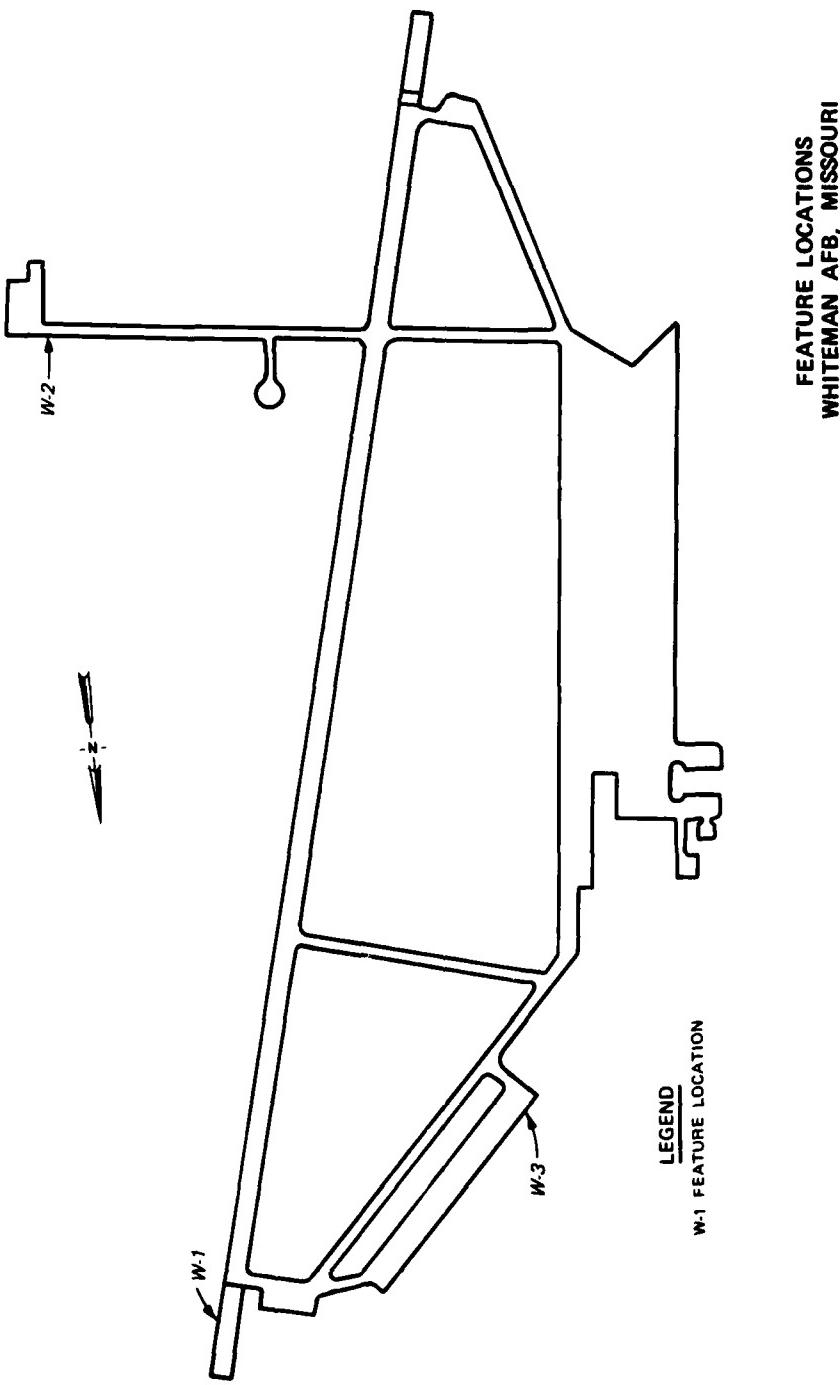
Layout of Airfield Pavement Showing Locations of the Test Features
